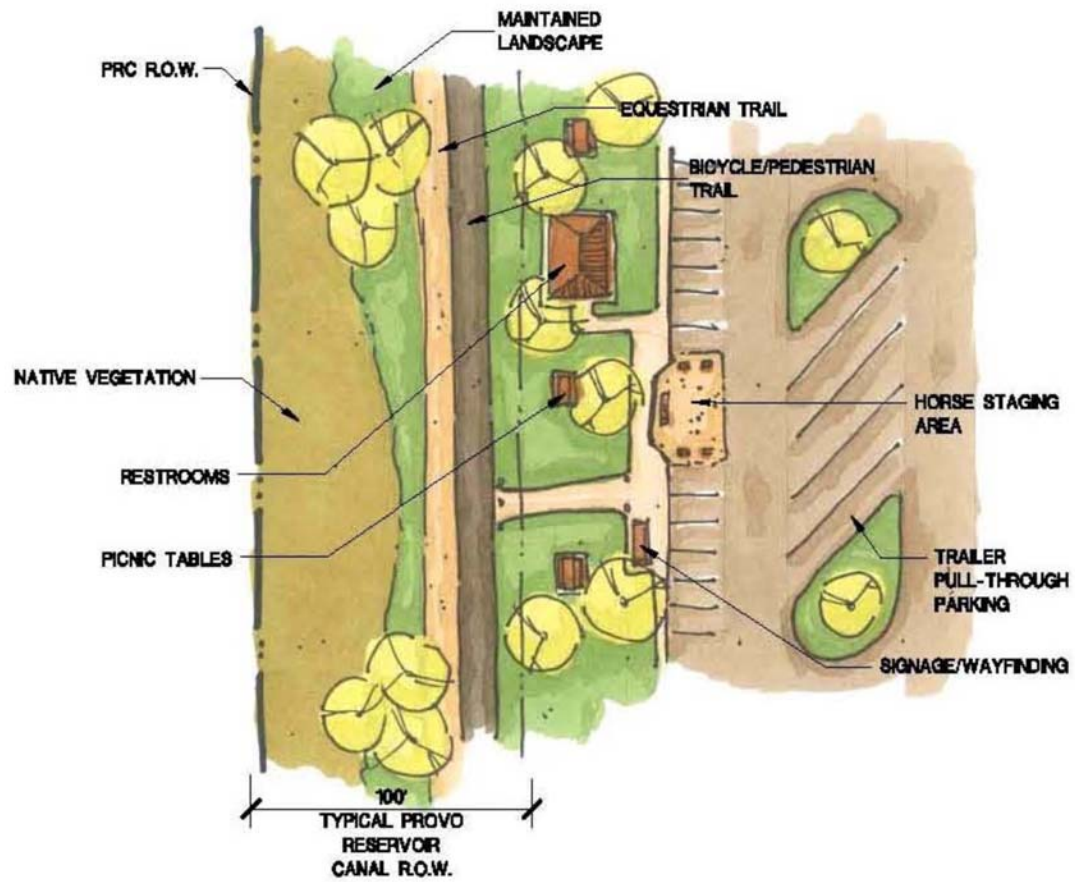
Example of a Trailhead (Not all trailheads will have equestrian staging areas and trailer parking)
